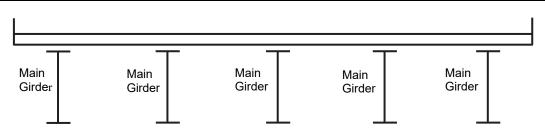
Cross Section of Conventional I/T-Girder Type
